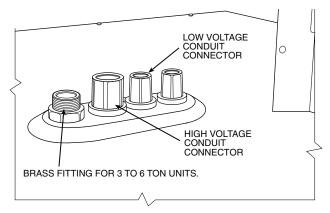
Thru-Base Connection Fittings (Units Built Prior to 4/15/2019)
